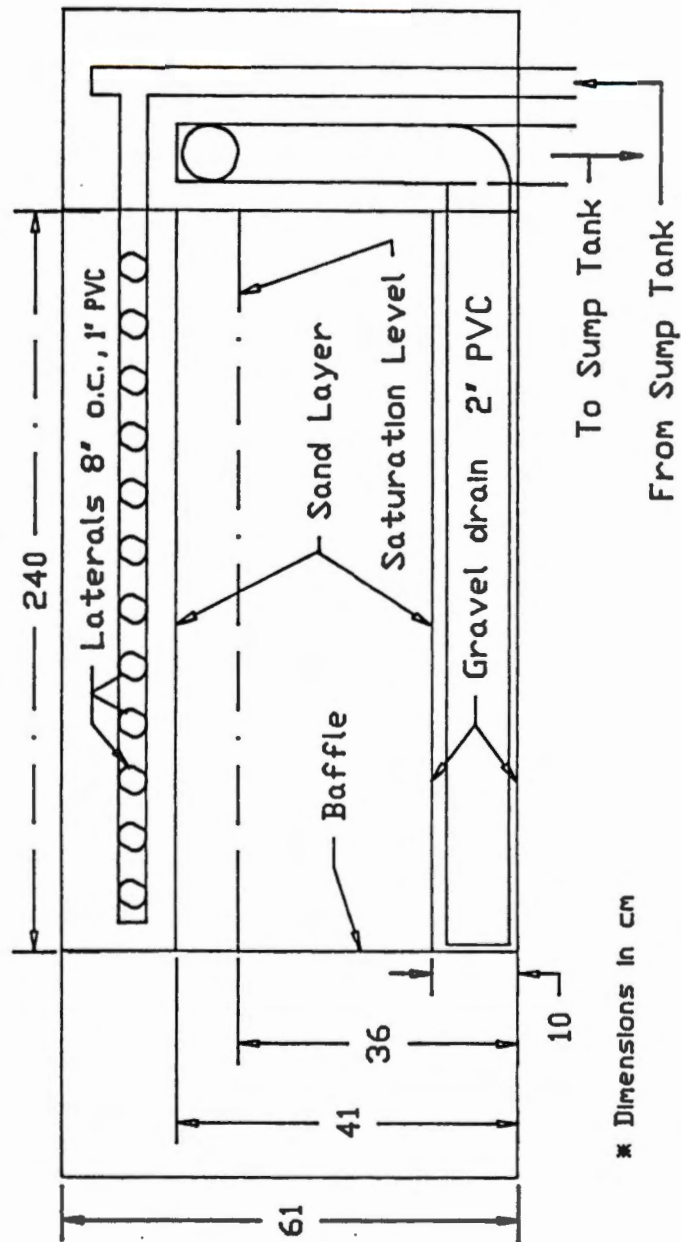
Sand Filter Cross Section to Show Saturation Zone Within Sand Layer.
